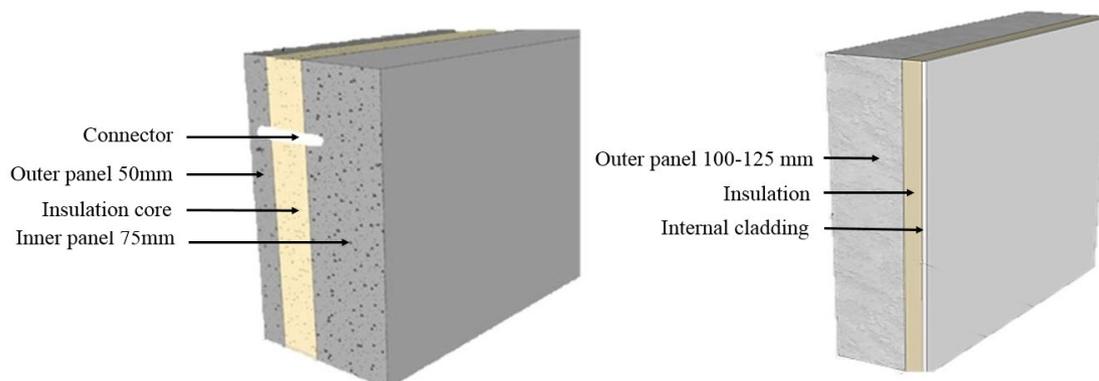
Insulated precast concrete panels (sandwich and single layer precast panel).
